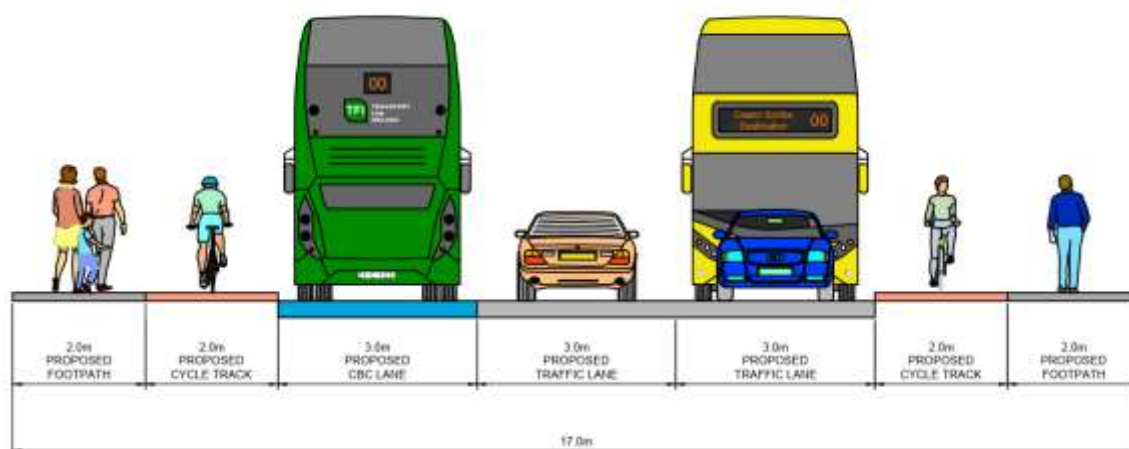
Typical Traffic Management Cross Section (A - A)
